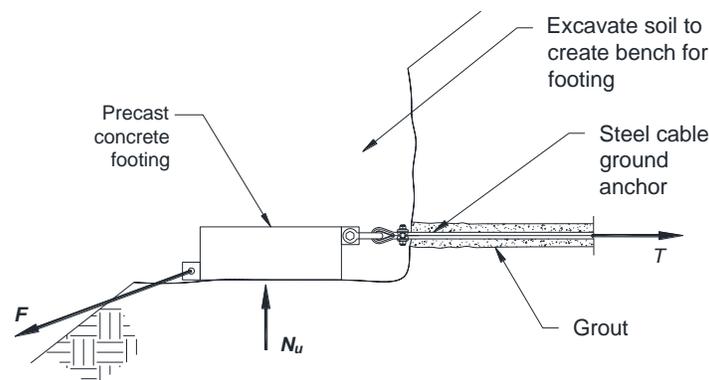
Precast concrete footing to accommodate lateral loading on upper foundation
